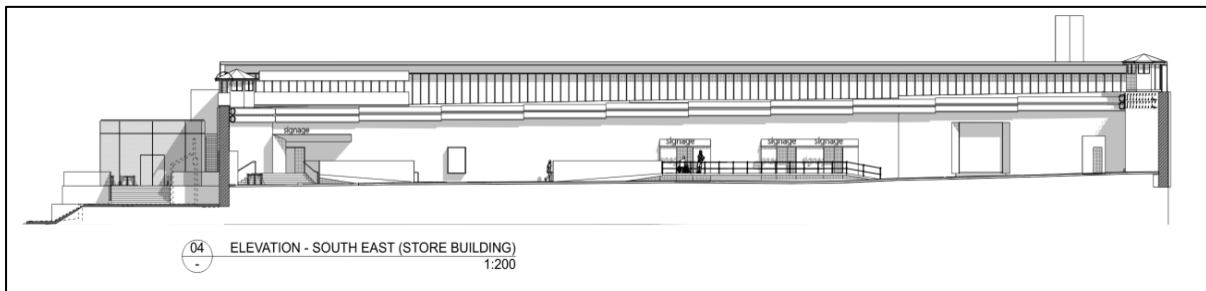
Building 14 Southeast Elevation. Source: Maitland City Council dated 20/06/2023
